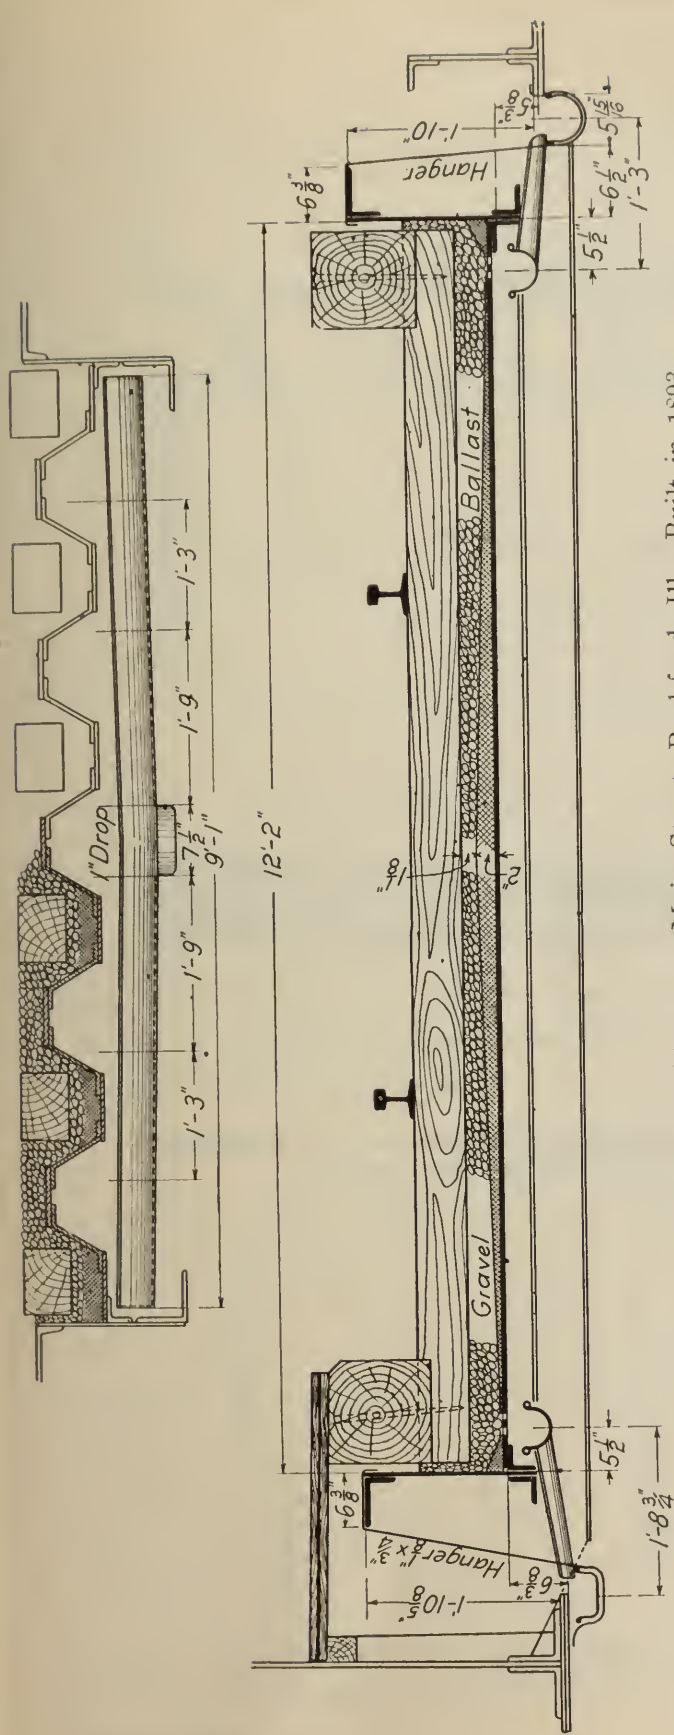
Section of Bridge over Main Street, Rockford, Ill. Built in 1893.
